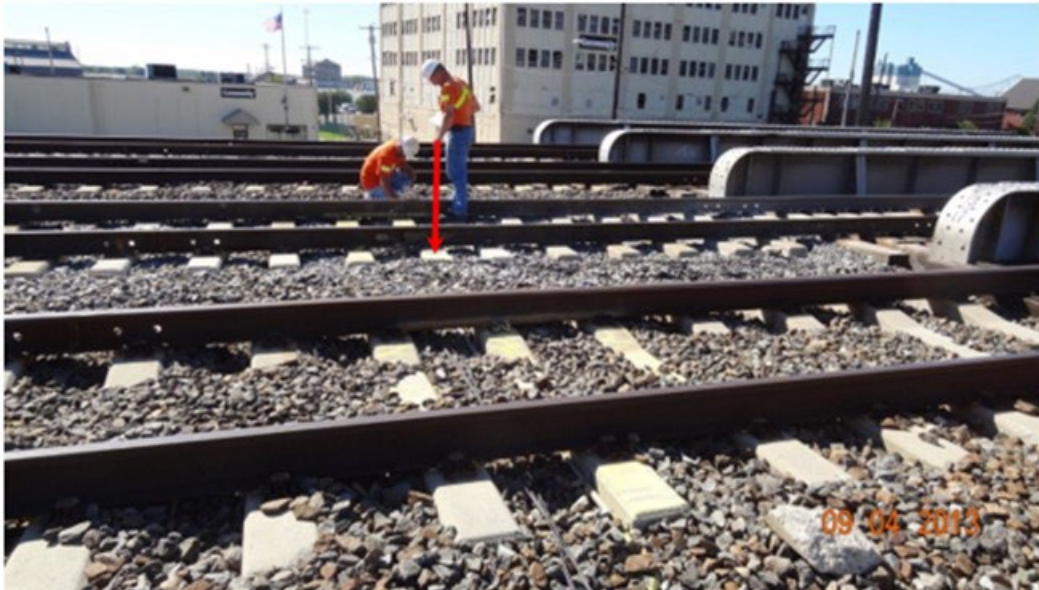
View of Tracks 1 through 4 at top of elevated railway with Track 4 at the bottom of the photograph and Track 1 at the top of the photograph
